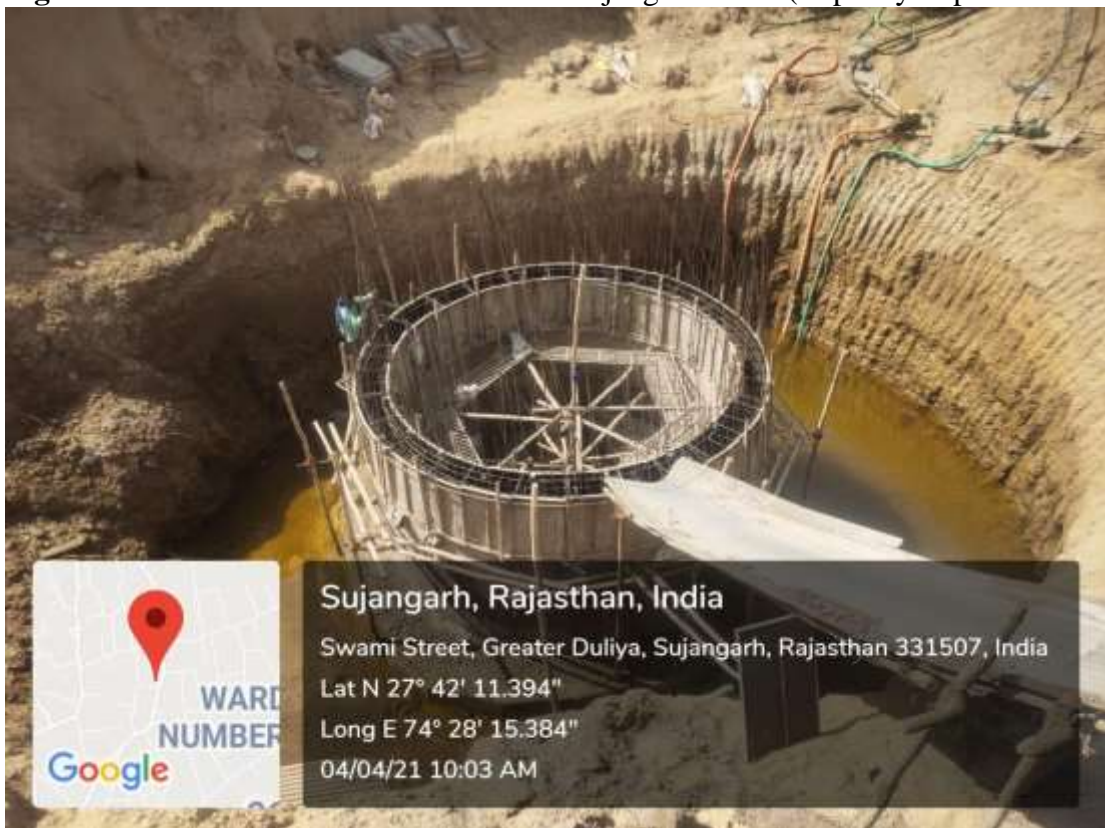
D: One Pump house for low laying area under construction in Sujangarh Rural
